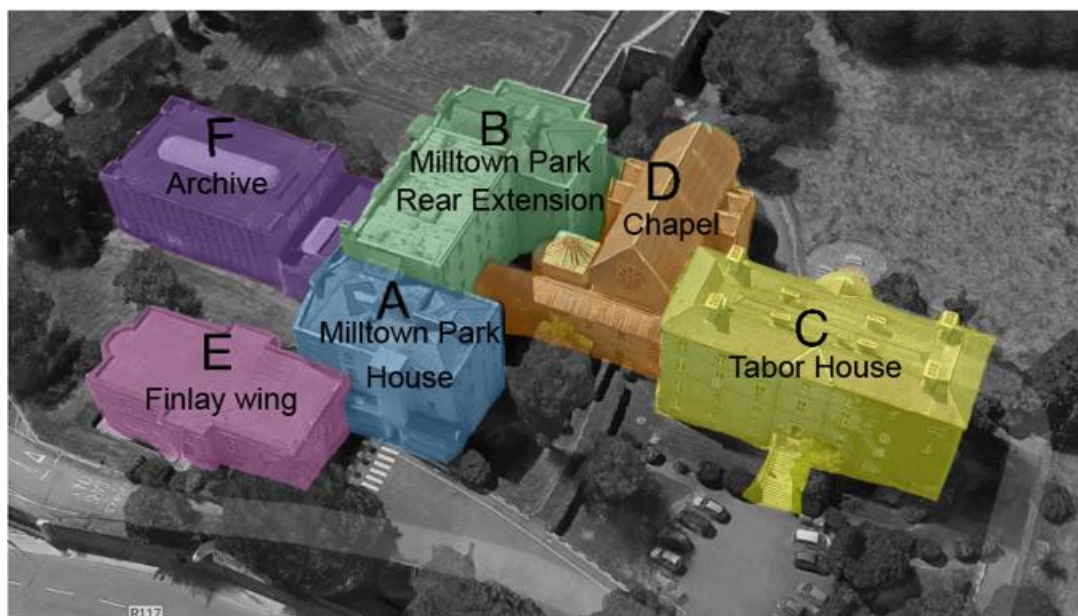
Outline of Building Range Which Identifies Each Building Element Existing at the Subject Lands
